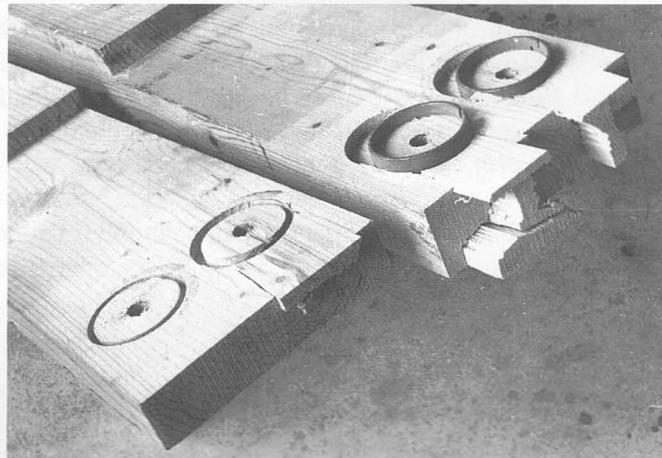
Shear failure of middle and side member in a ring connector joint loaded in tension.
